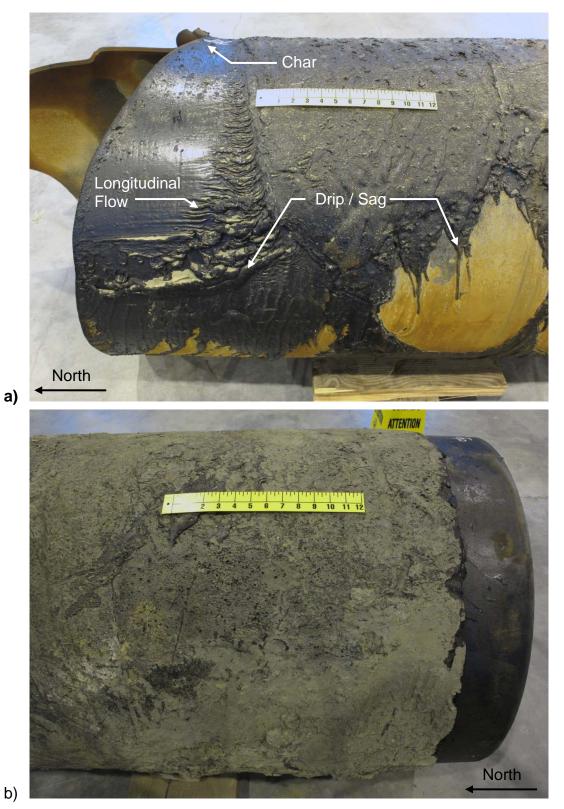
Condition of the asphalt coating on the southern section; a) Adjacent to the circumferential fracture; b) Away from the fracture close to the cut end.
